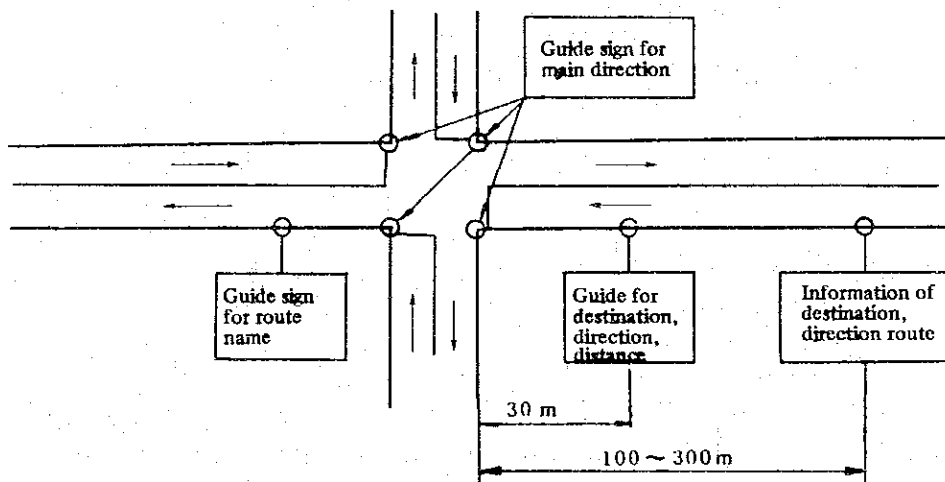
Typical Locations of Guide Sign Installation
